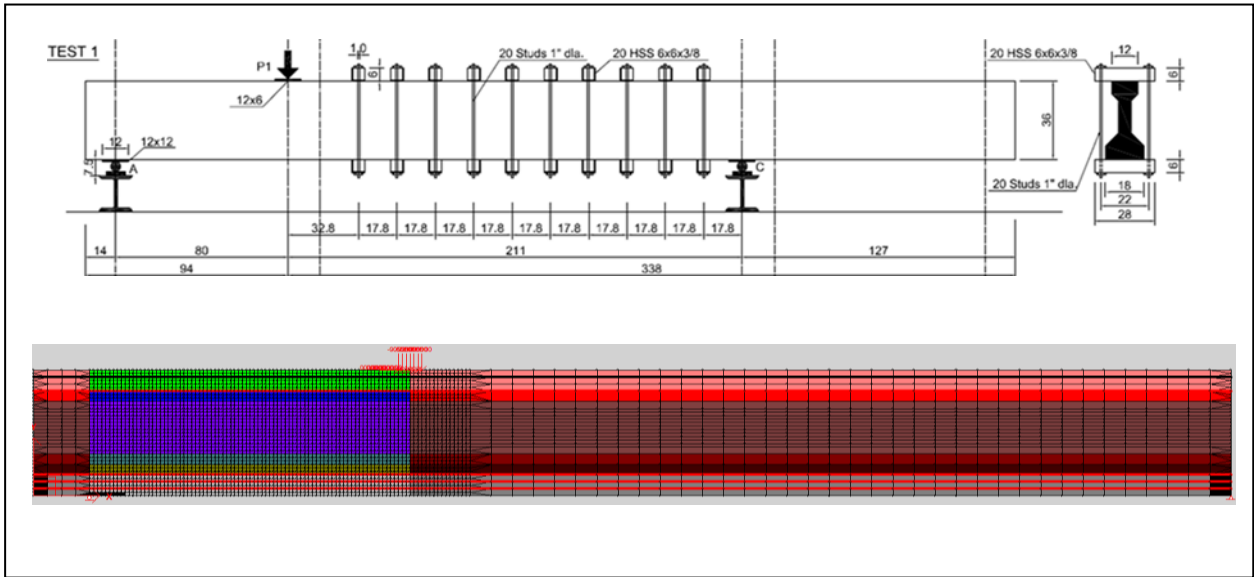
Beam 1 Test 1 Model (dimensions in inches).
